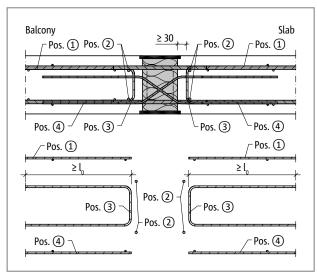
Schöck Isokorb® XT type D: On-site reinforcement
